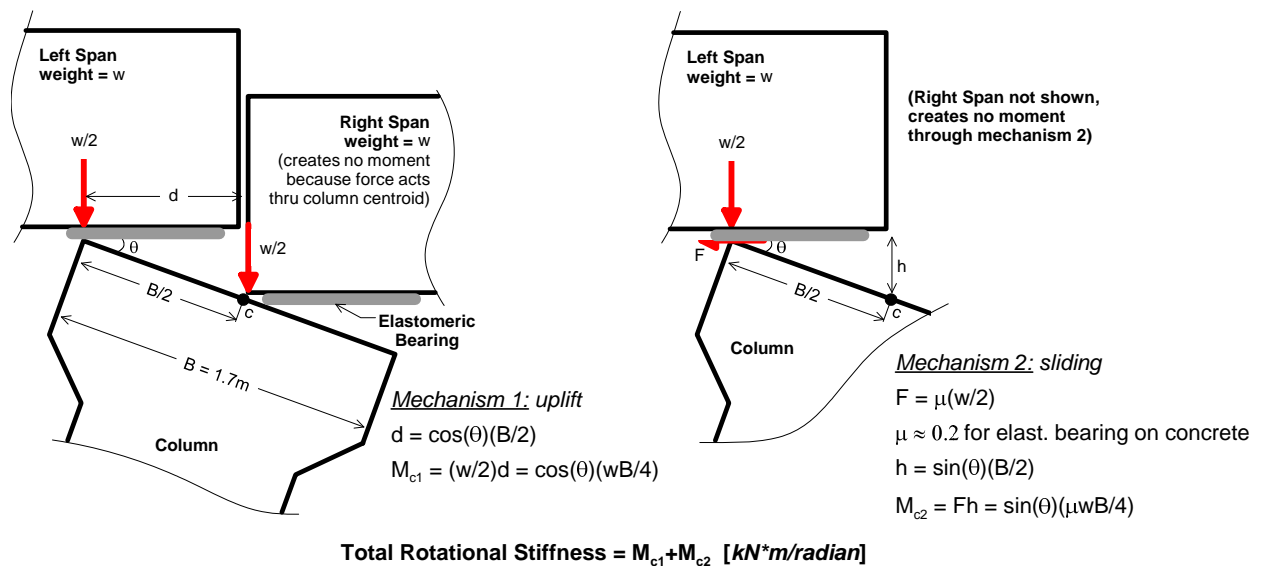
Formulation of rotational stiffness of railroad bridge deck spans transferring load to column through elastomeric bearings.
